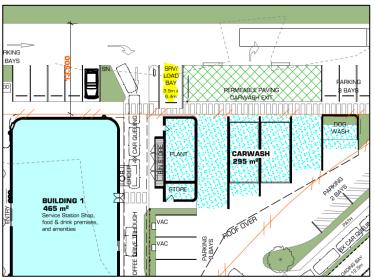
Extract from Site plan Drg DA0002 – P11 – Push Architecture
